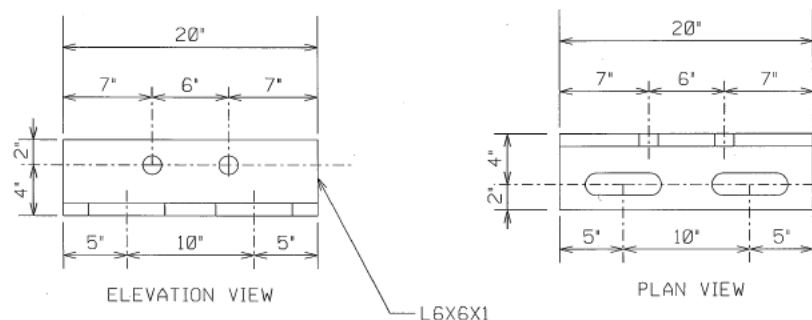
Little Bear Creek Abutment Connection for Type III Girders
